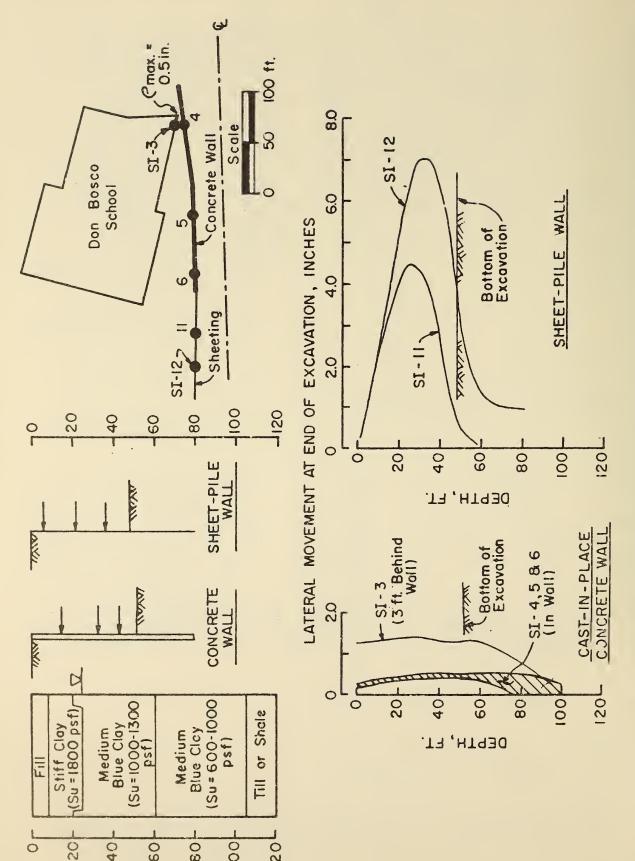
COMPARISON OF WALL DEFLECTIONS in Boston, Massachusetts for a cast-in-place concrete wall and a sheet-pile wall at nearby sections of excavation in medium clay. (After D. J. D'Appolonia, and with permission)
